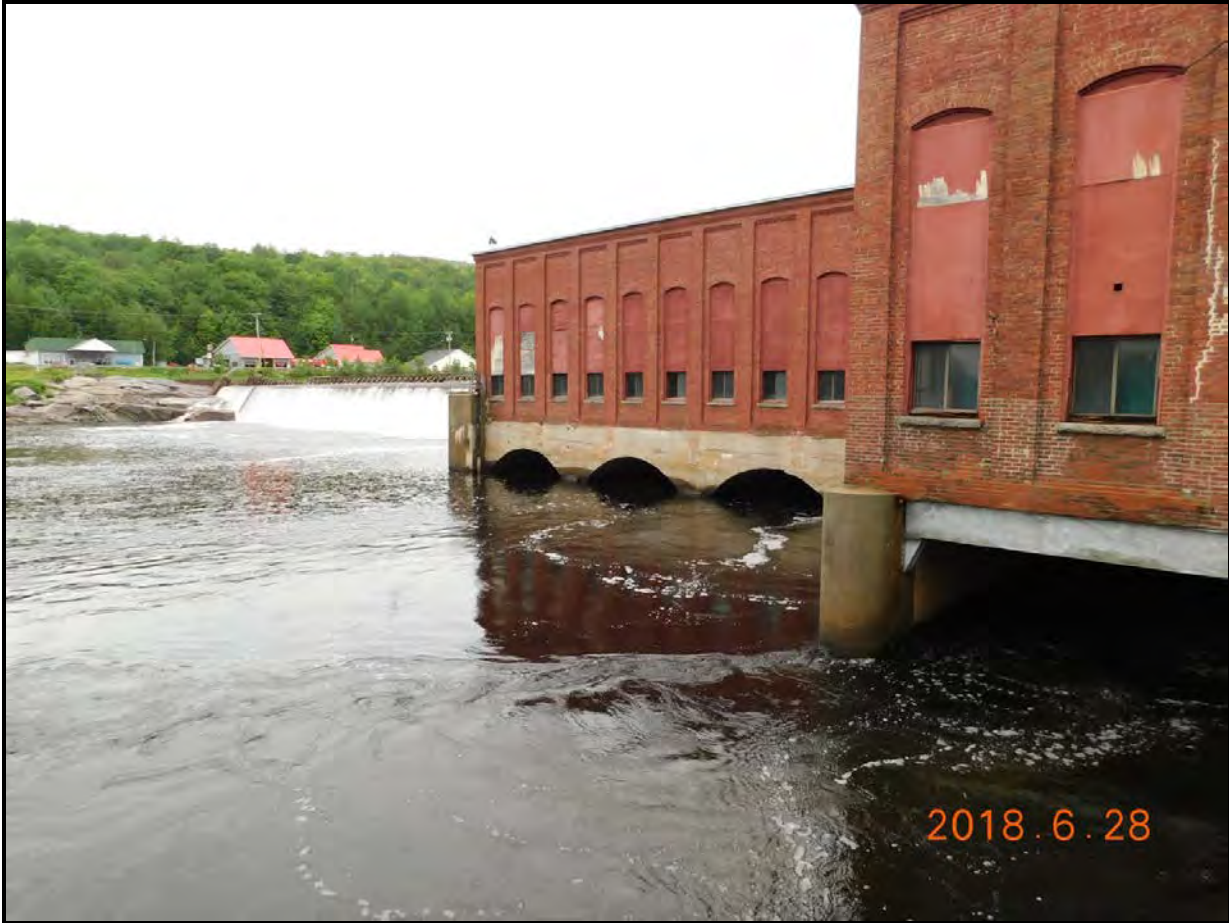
VIEW OF THE SAWMILL PROJECT GATEHOUSE AND POWERHOUSE.
